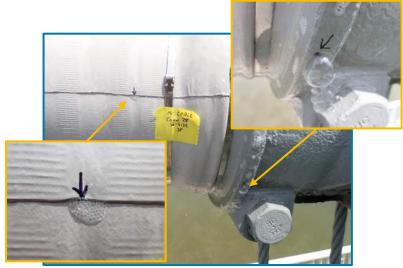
Minor leaks in the cable wrap and at an open hole in the suspender collar of the North Cable at Suspender Cable 28 (looking north).
